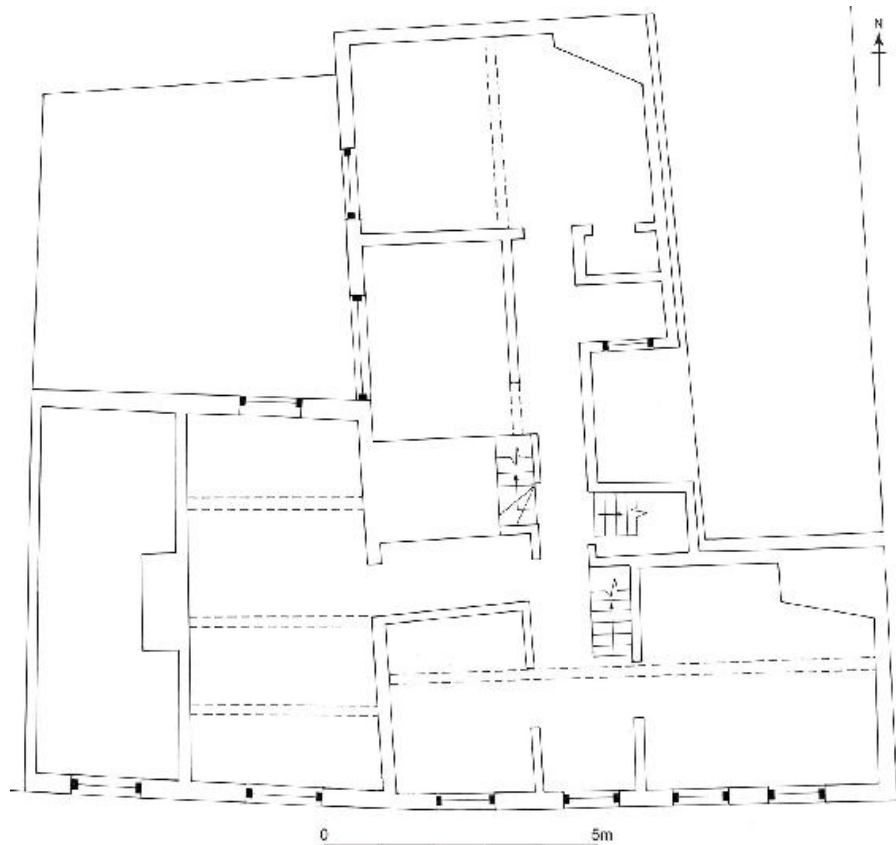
First-floor plan of The Grapes. East Street is to the bottom, Capuchin Lane to the right. The great stack (serving the pewterer's hearths) can be seen at the junction of the front and rear ranges
